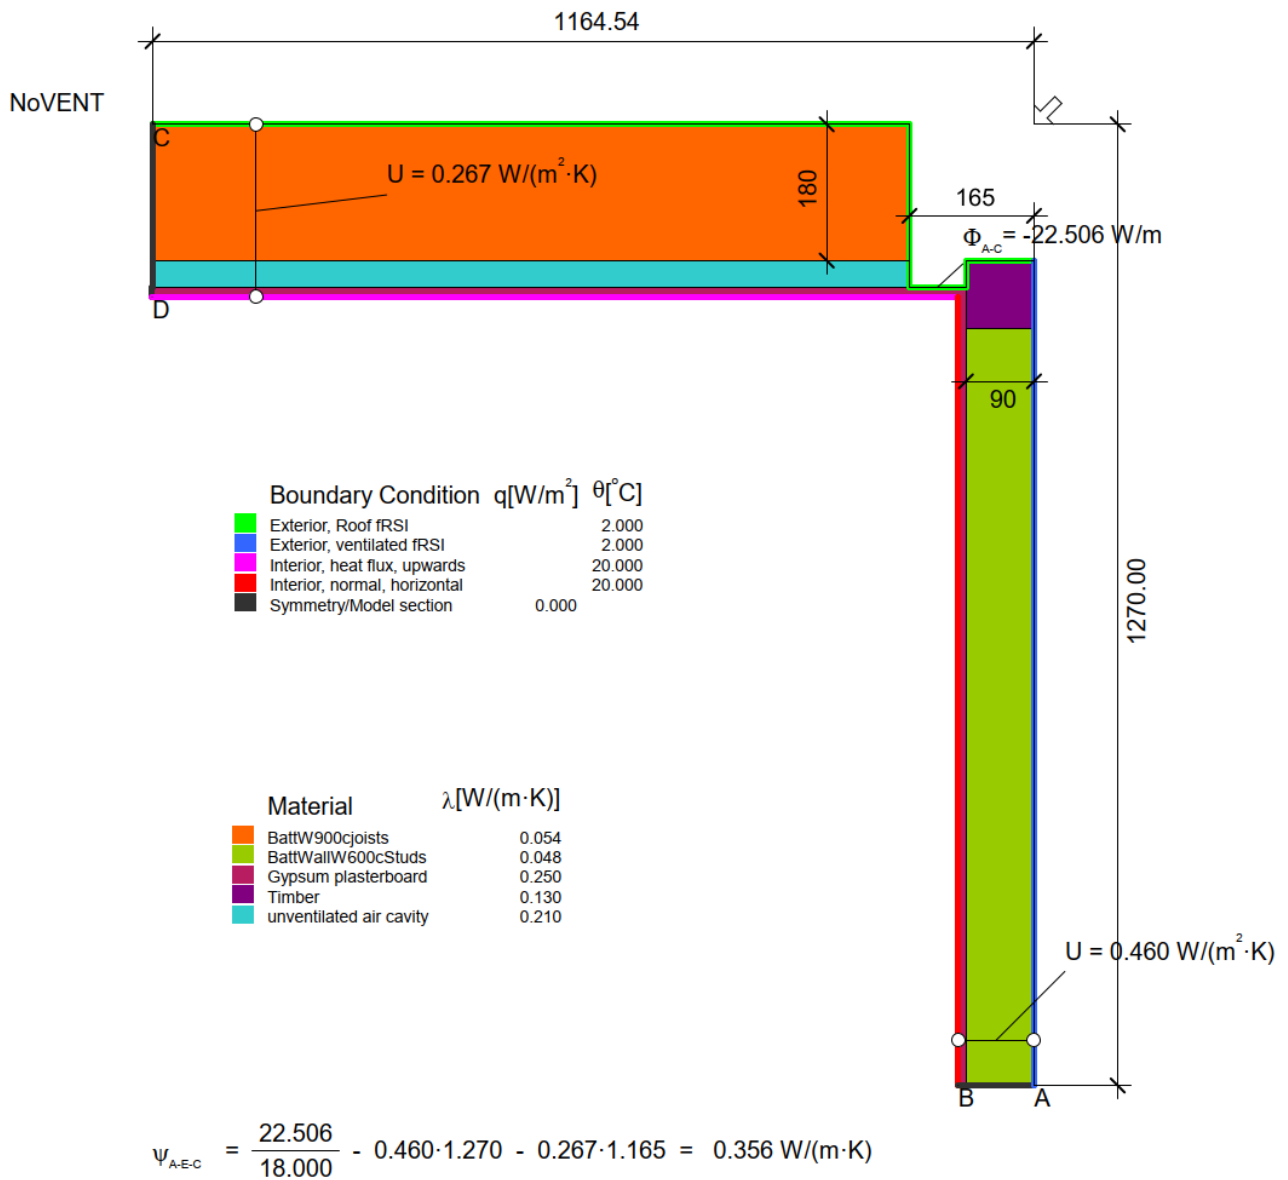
Current practice - Thermal bridge due to insulation held back to maintain ventilation under roofing.
